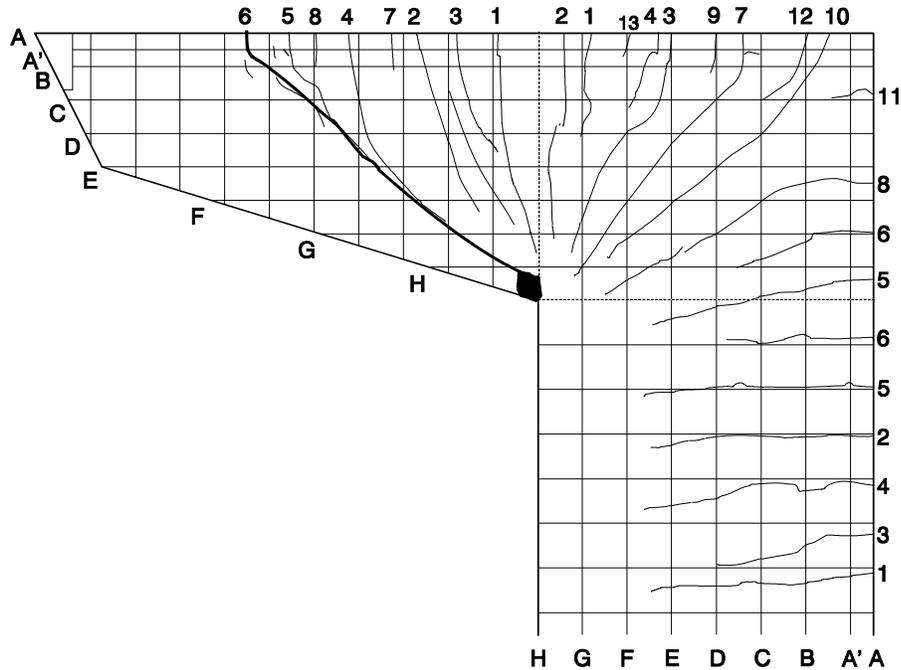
Cracking pattern on south face of Specimen POJ-PU-54-TH at failure
